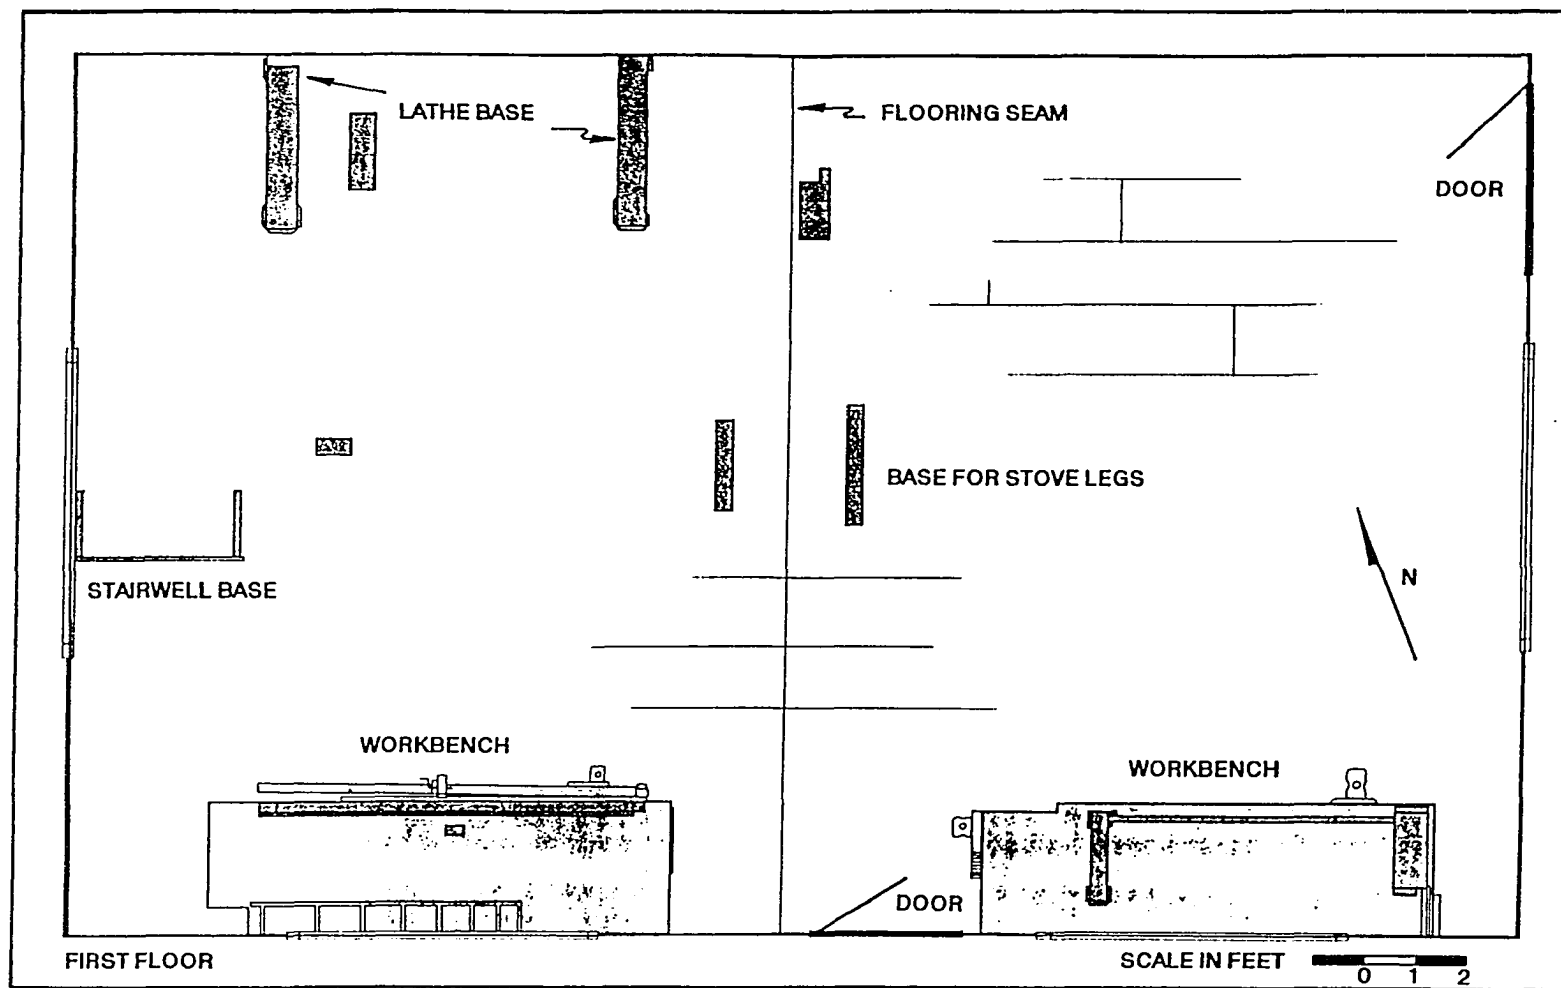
Plan of Kersh shop first floor. Drawing, JMUARC. Kersh collection, MAFC.
